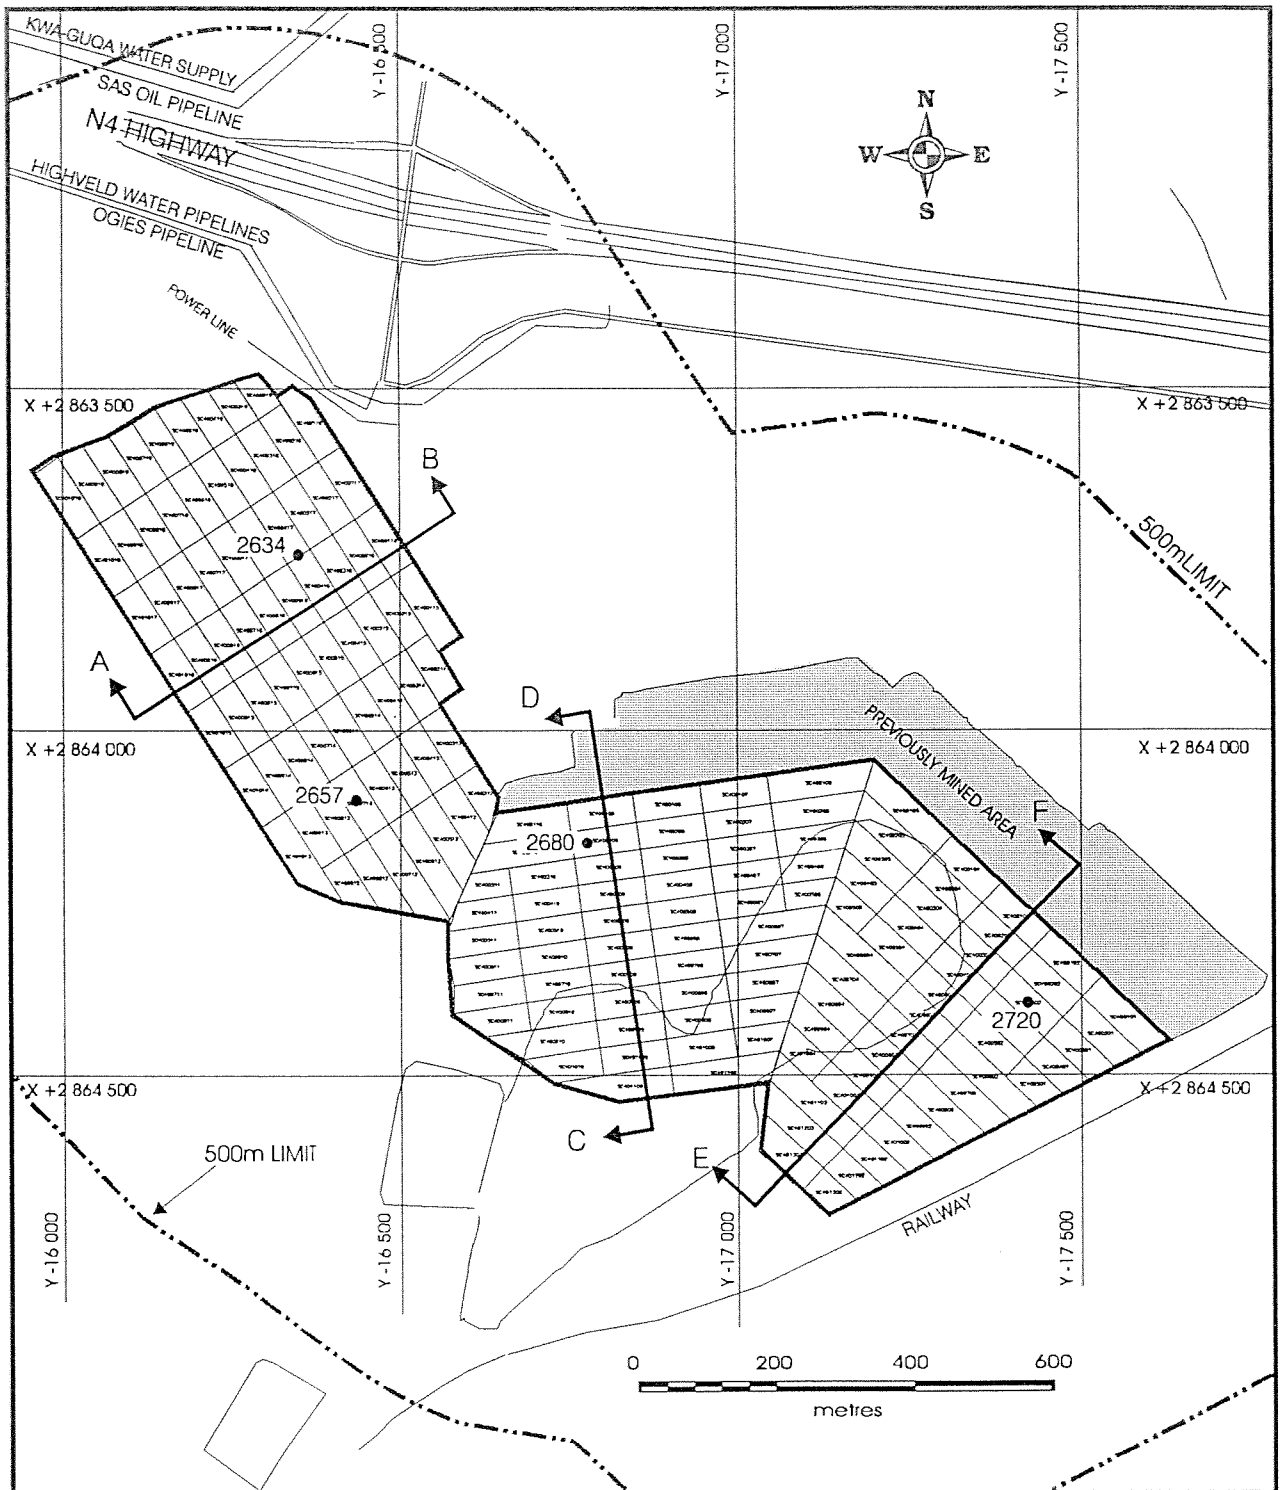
SCHOONGEZICHT MINI-PIT LAYOUT SHOWING SELECTED BOREHOLE AND MINE CROSS SECTION LOCATIONS.
